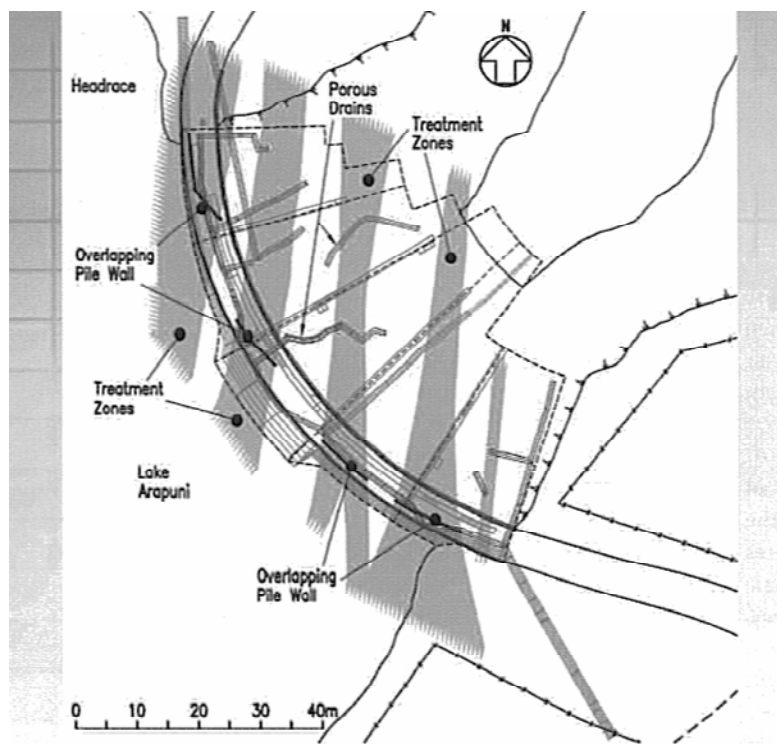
Plan of long-term seepage control remedial works, with cut-off walls, treatment zones and underdrain
